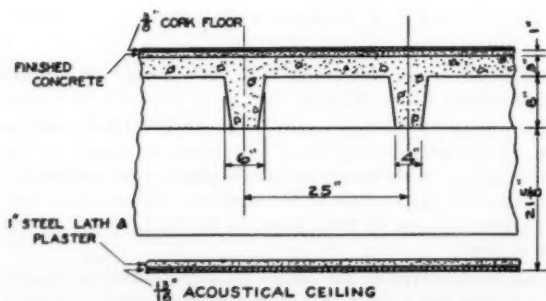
CROSS-SECTION OF FLOOR AND CEILING
